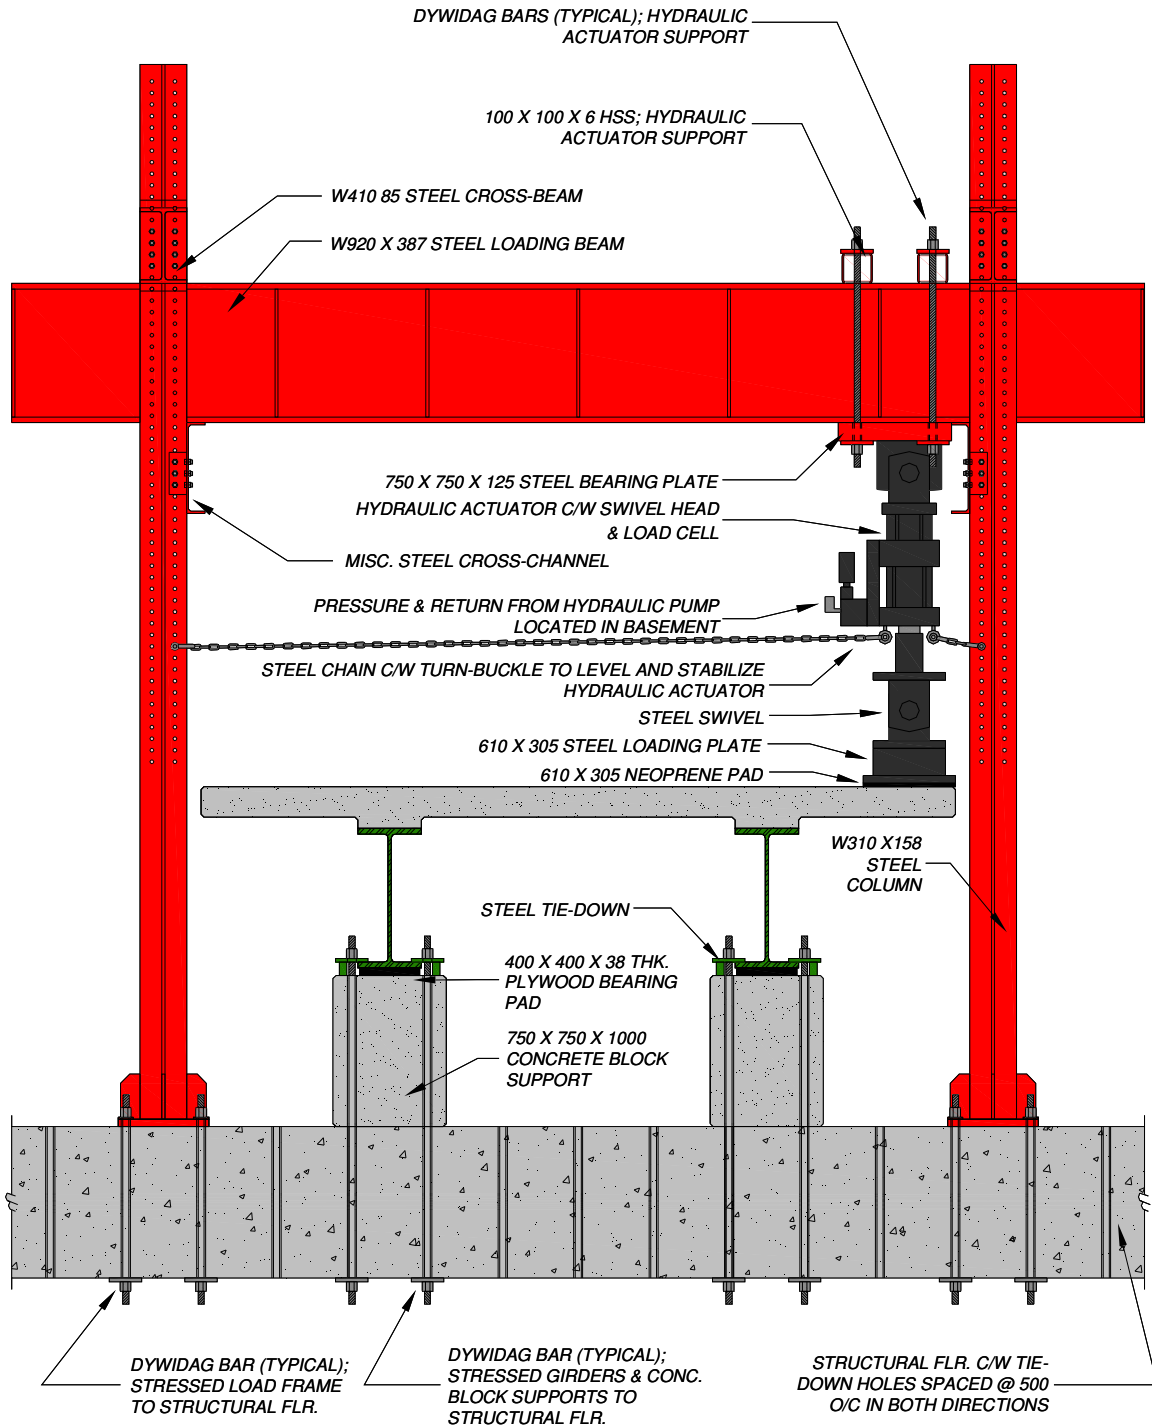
Test set-up for static and fatigue destructive testing of cantilevers (Klowak, 2007)
